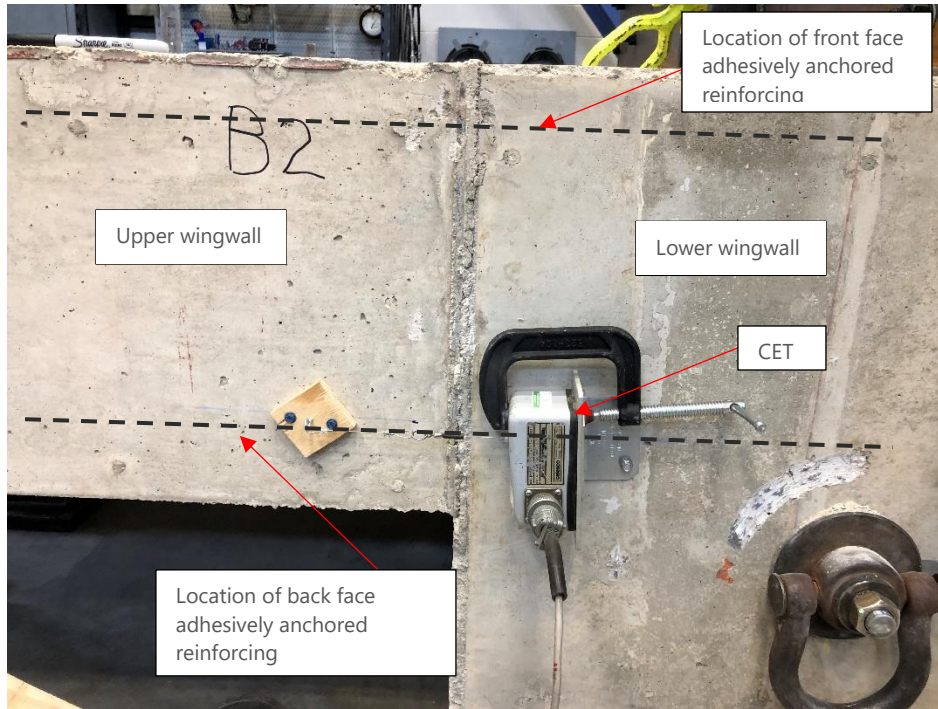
CET positioned across wingwall joint (dashed lines indicate location of adhesively anchored reinforcing steel)
